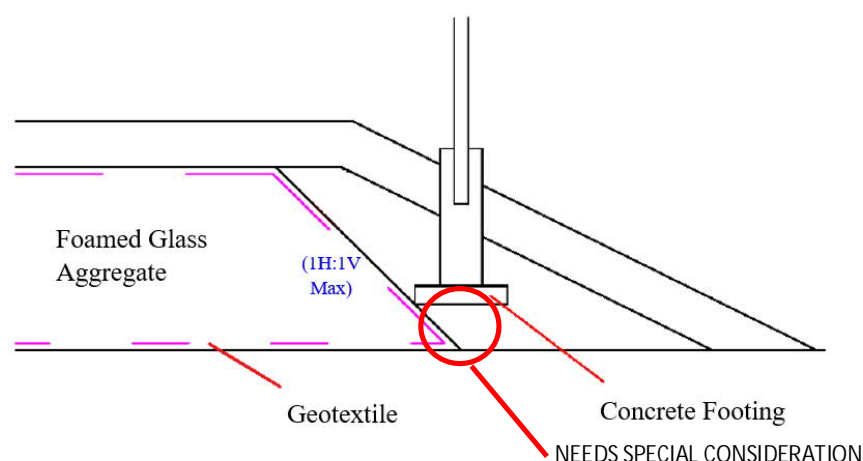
Typical Detail of Lighting Foundation where FGA is used.
